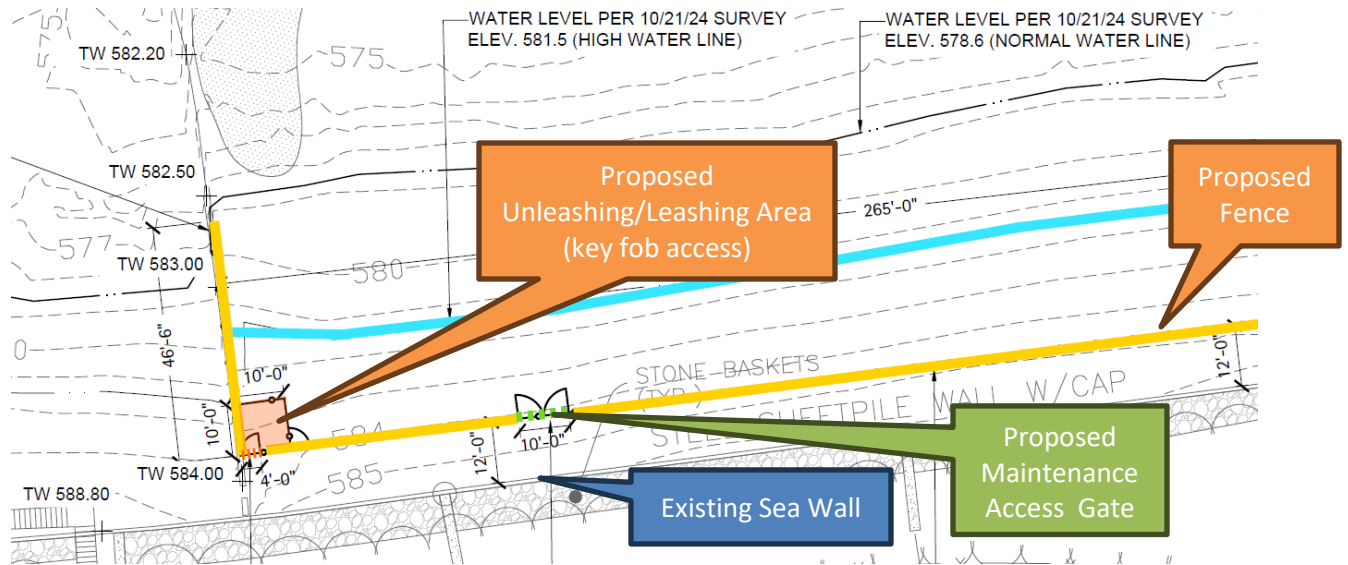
North and West Portion of Proposed Fencing (Excerpt of Sheet L2.0)
